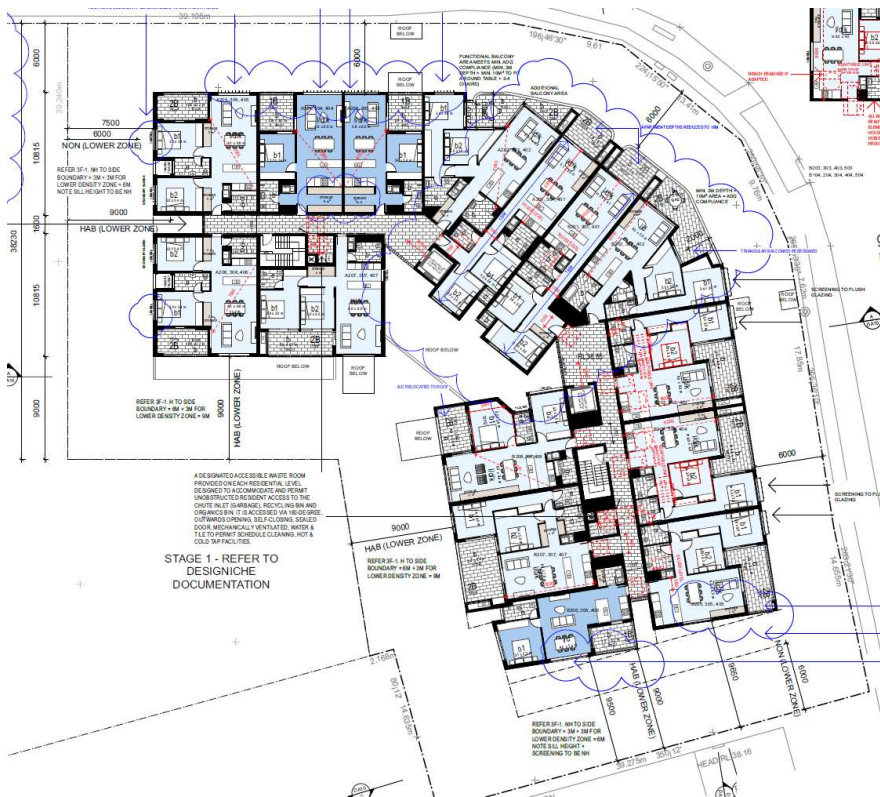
Proposed Typical Level 1, 2 and 3 Floor Plan for Stage 2 Residential Flat Building, incorrectly Titled on plans as “Typical Level 2-4 Plans”. This plan represents the second, third and fourth storeys of the building.
